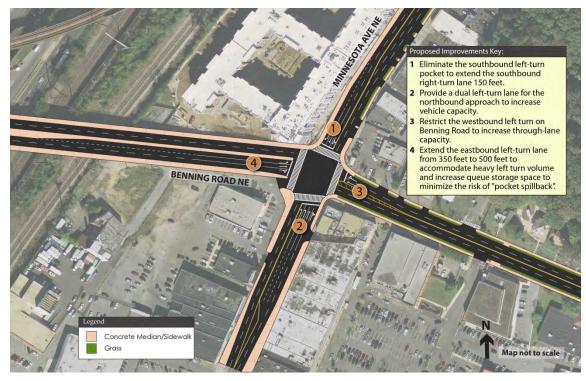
Proposed Lane Configuration at Benning Road and Minnesota Avenue Intersection
